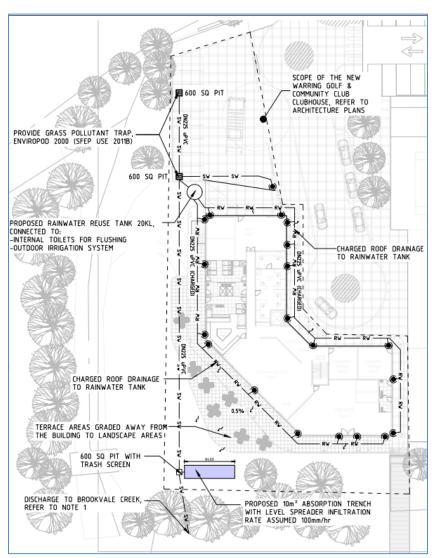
Stormwater Management Plan (Source: Stellen Consulting, 2022)
